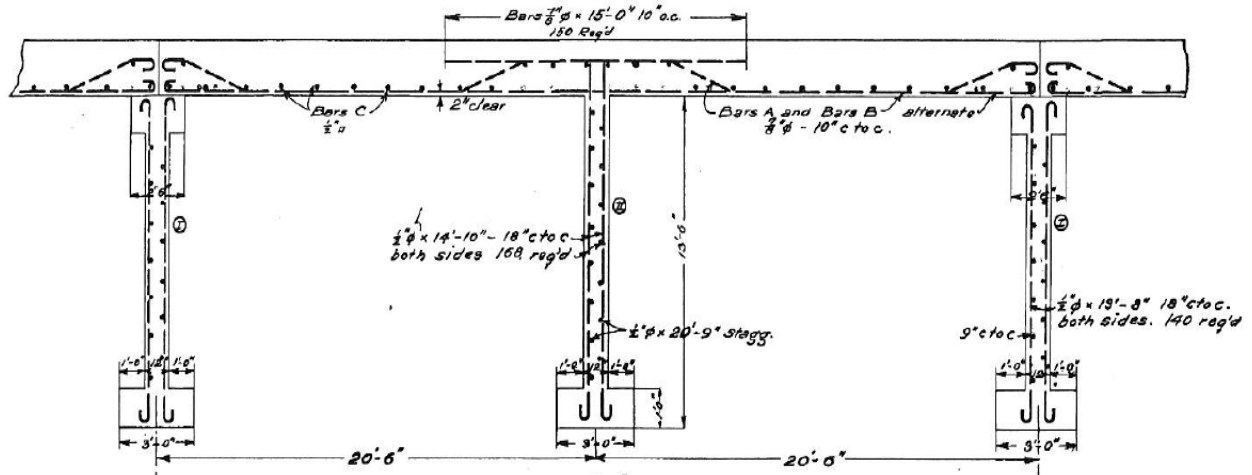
Longitudinal Elevation Section of Two-Span Continuous Bridge in Fayette Co. from SHDA (1924)
